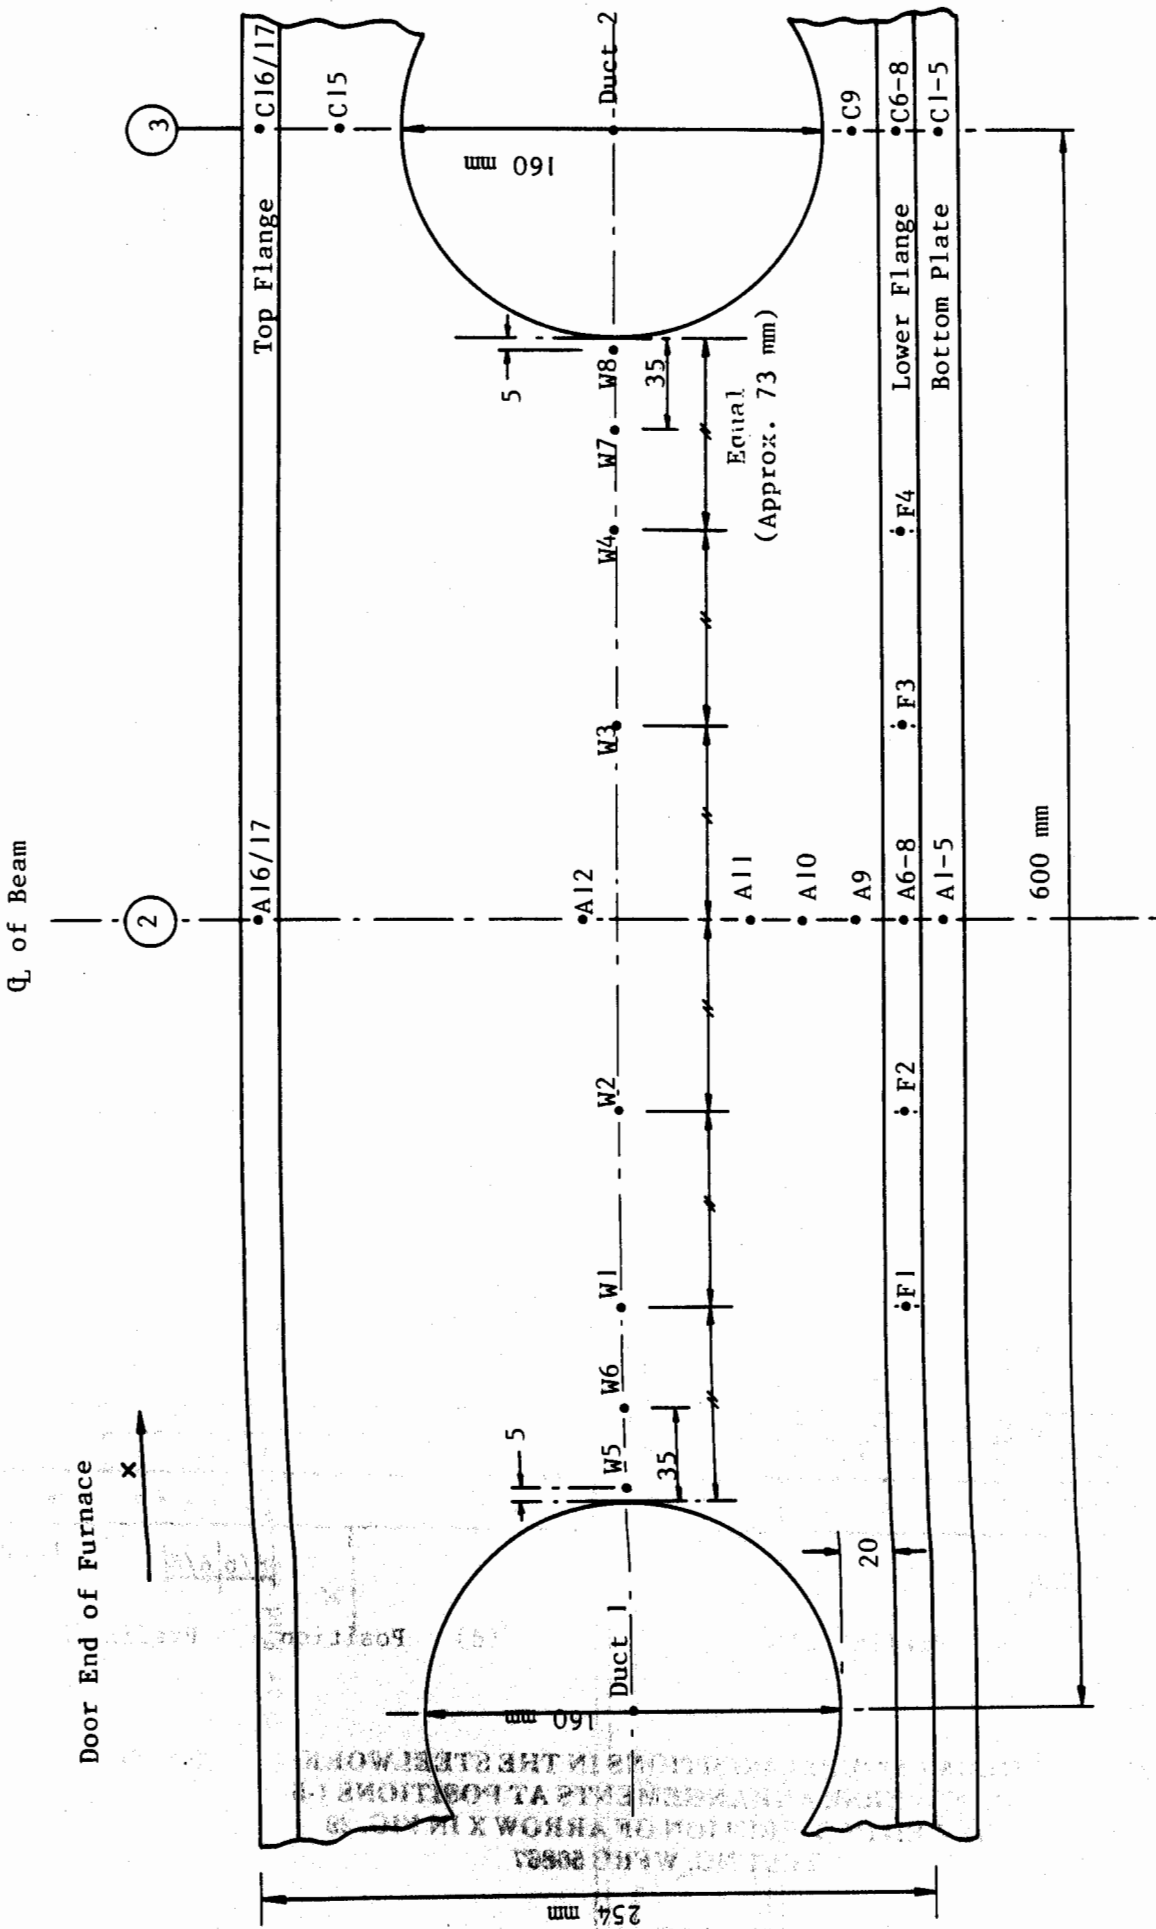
THERMOCOUPLE POSITIONS IN THE STEELWORK - LONGITUDINAL ARRANGEMENT IN THE CENTRAL (R4/54)
